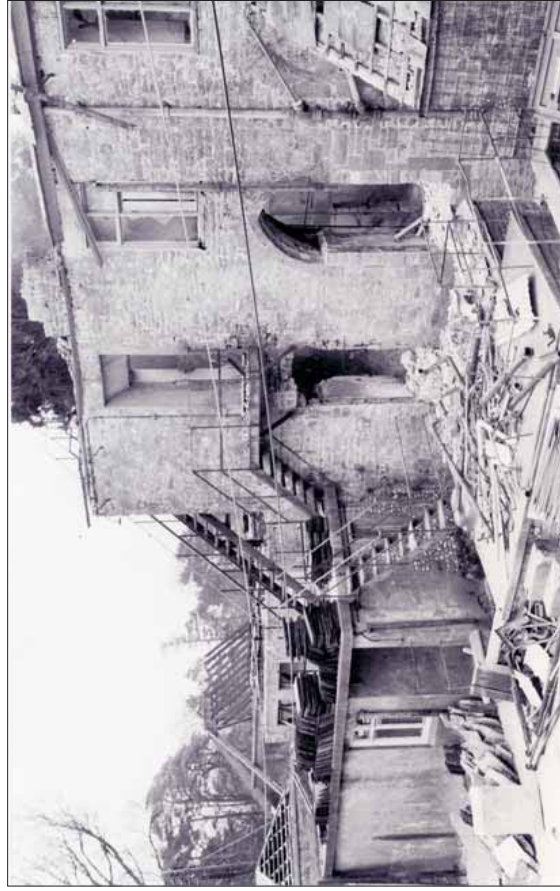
Photo of the north facing elevation of the northern range during demolition showing unblocked archways, 1965.
